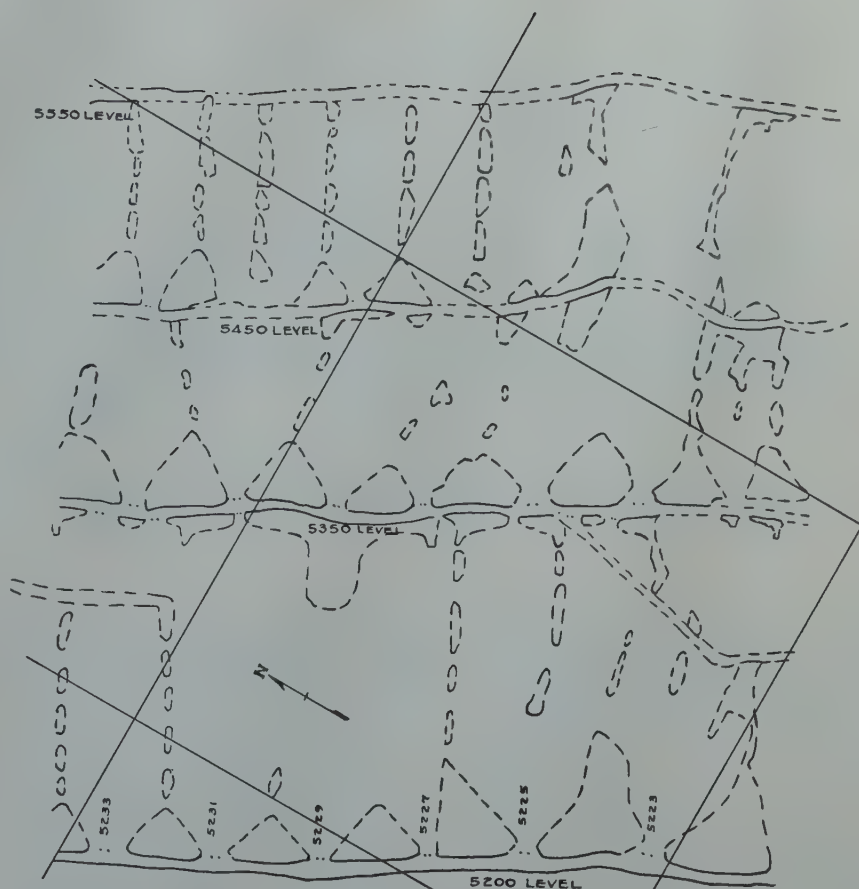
Plan showing room and pillar method of stopeing at Anderson mine.
